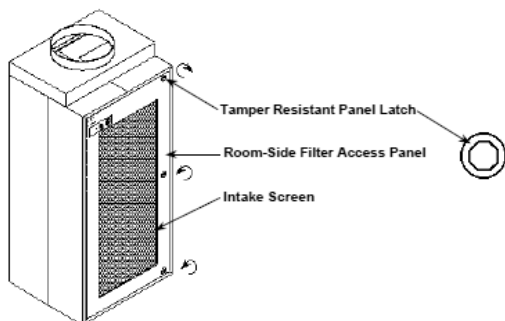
Filter Access Panel with Tamper Resistant Panel Latch
